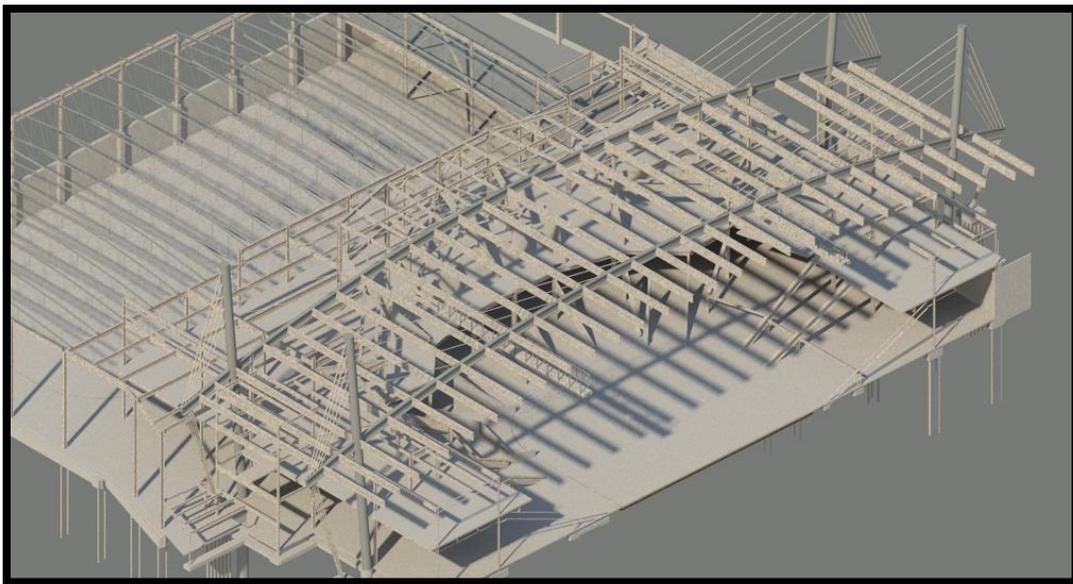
3D Perspective of the Cable-Stayed Roof System in Revit Structure
